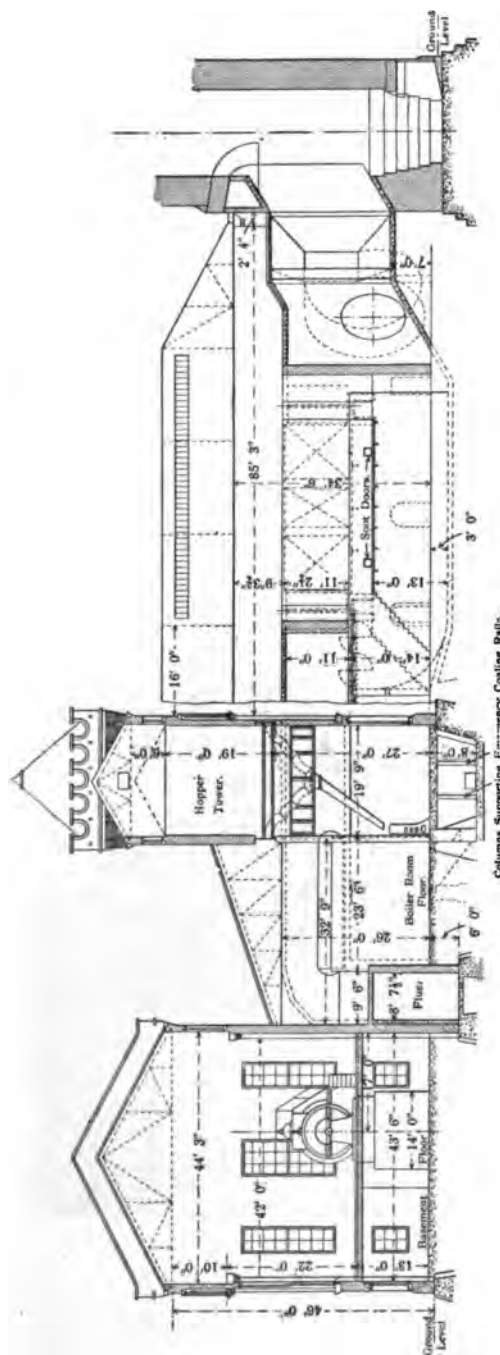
Neasden : Plan and Elevation of Power-House. (*Tramway and Railway World.*)
